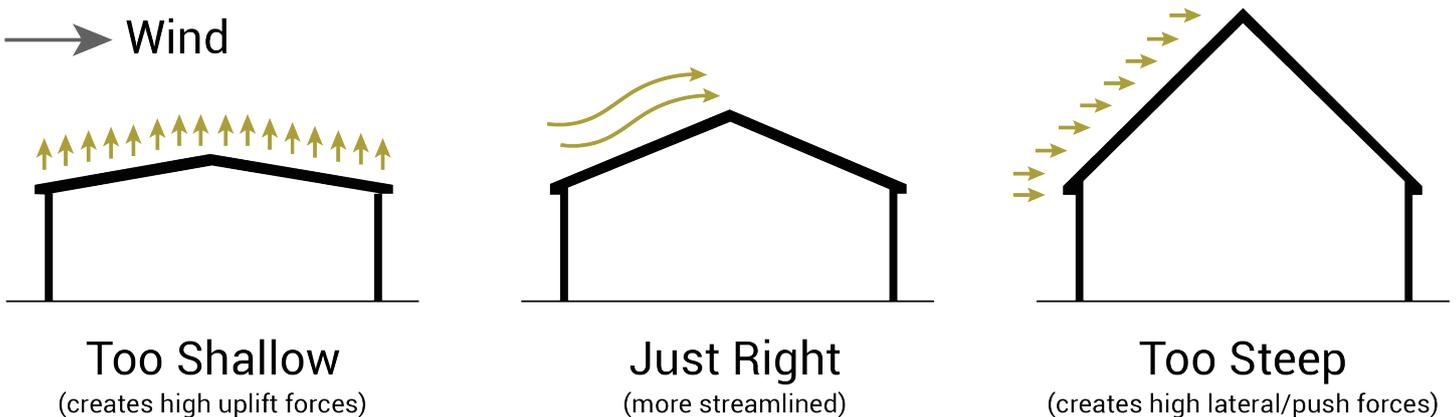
Roof pitches and their implications for wind forces. Source: MyPDH, (2022).
